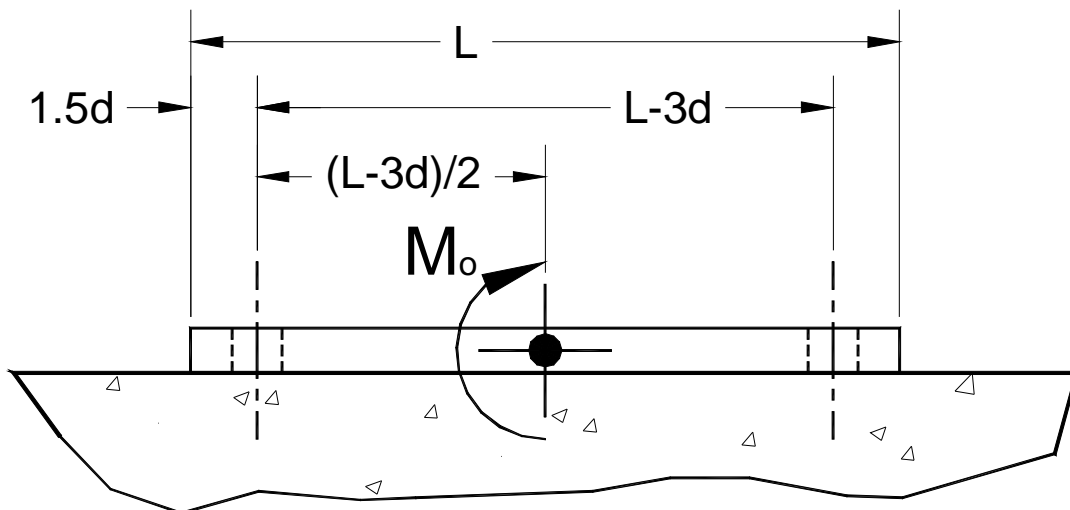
Assumed Base Plate Loading Arrangement for Case 1.
